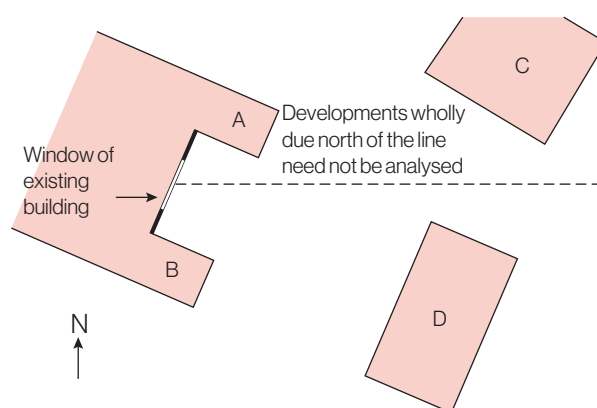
In analysing the sunlighting impact on the existing window, no check need be made for proposed extension A and new building C, as they lie within 90° of due north of the window. Proposed extension B should be checked, as should new building D if it subtends more than 25° to the horizontal, measured in section from the centre of the window
